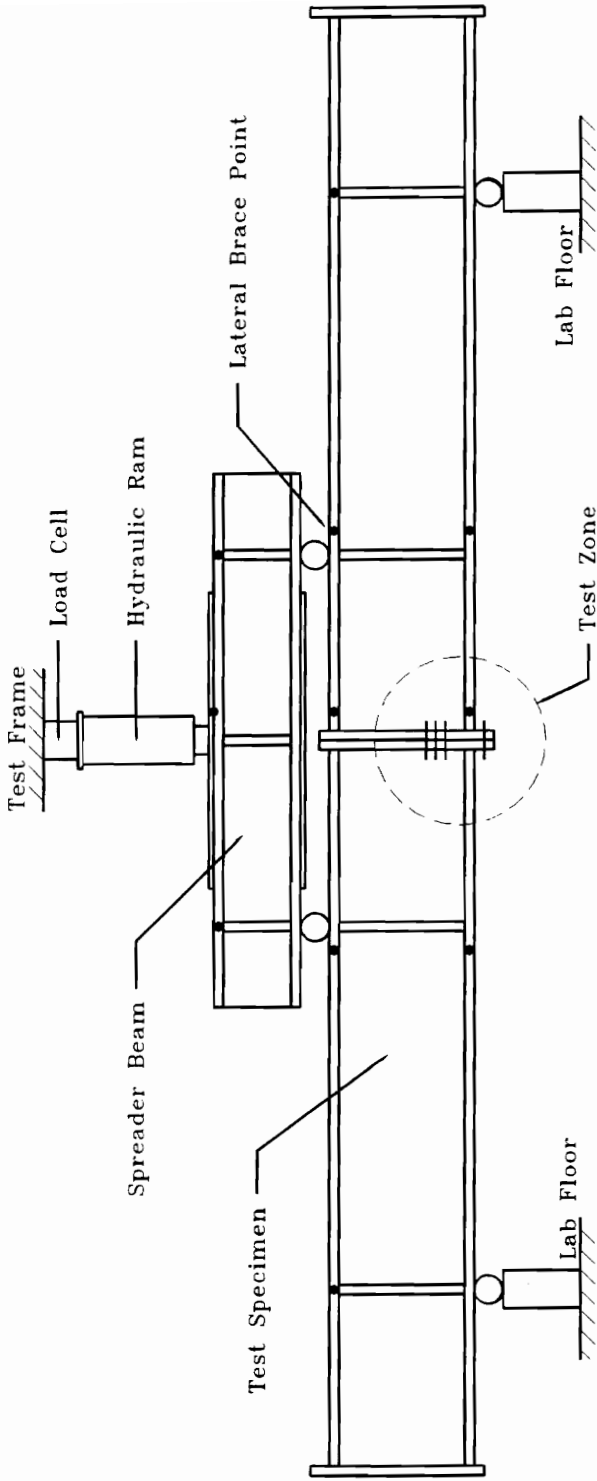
Longitudinal Elevation of Laboratory Test Setup
